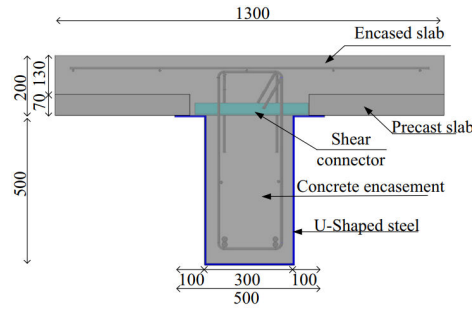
Specimens cross-section proposed by Keo et al. (2018)
